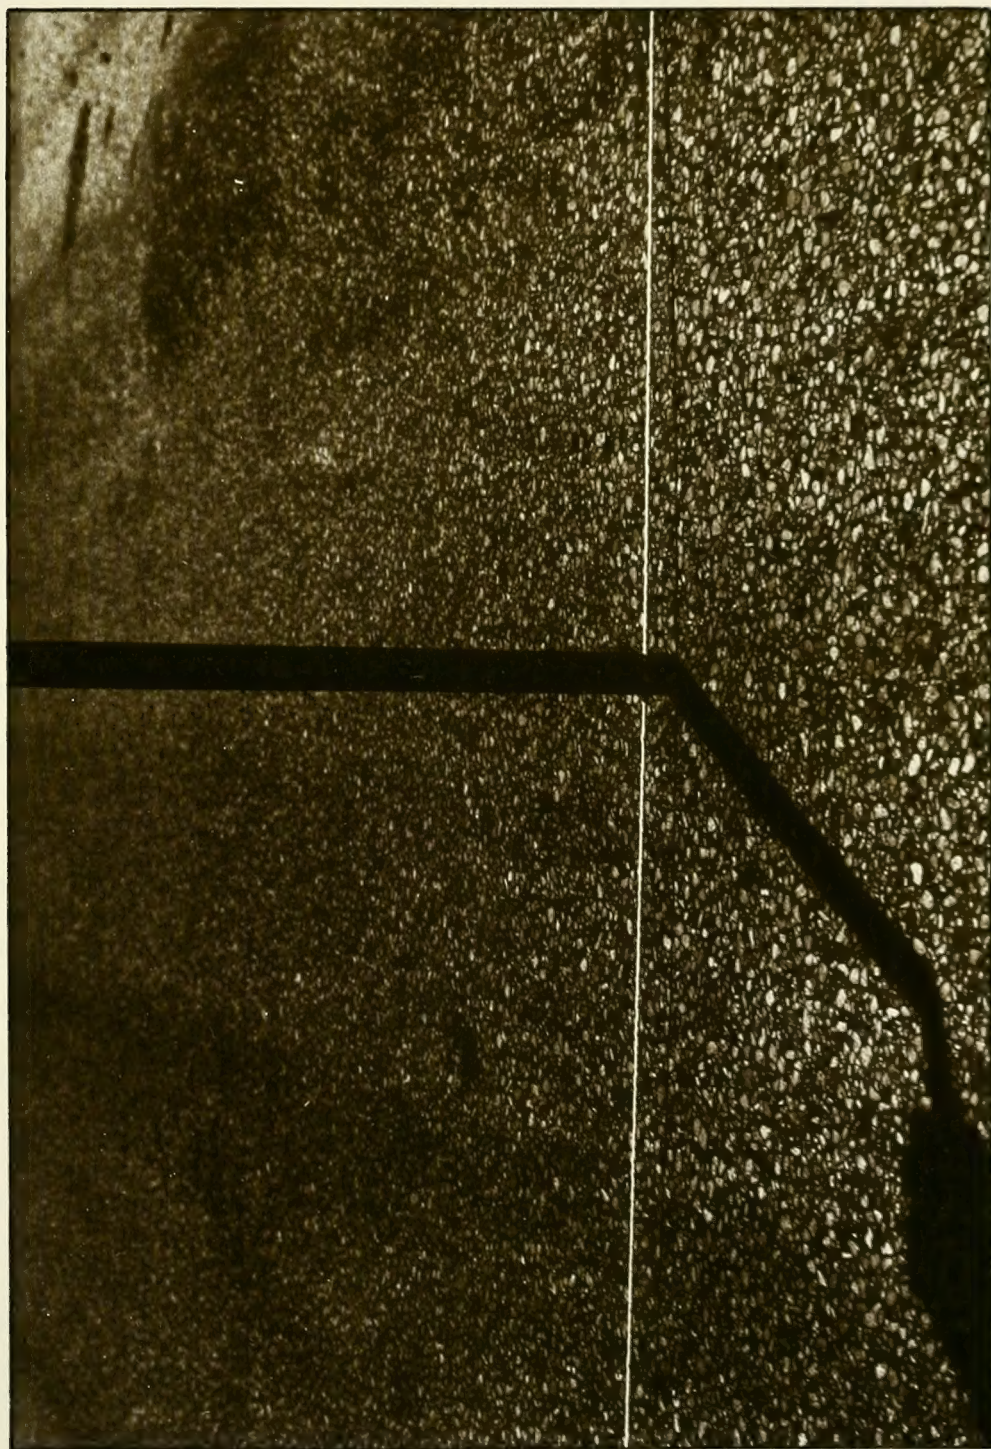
PAVEMENT CONDITION IN OUTSIDE LANE AT INTER-
